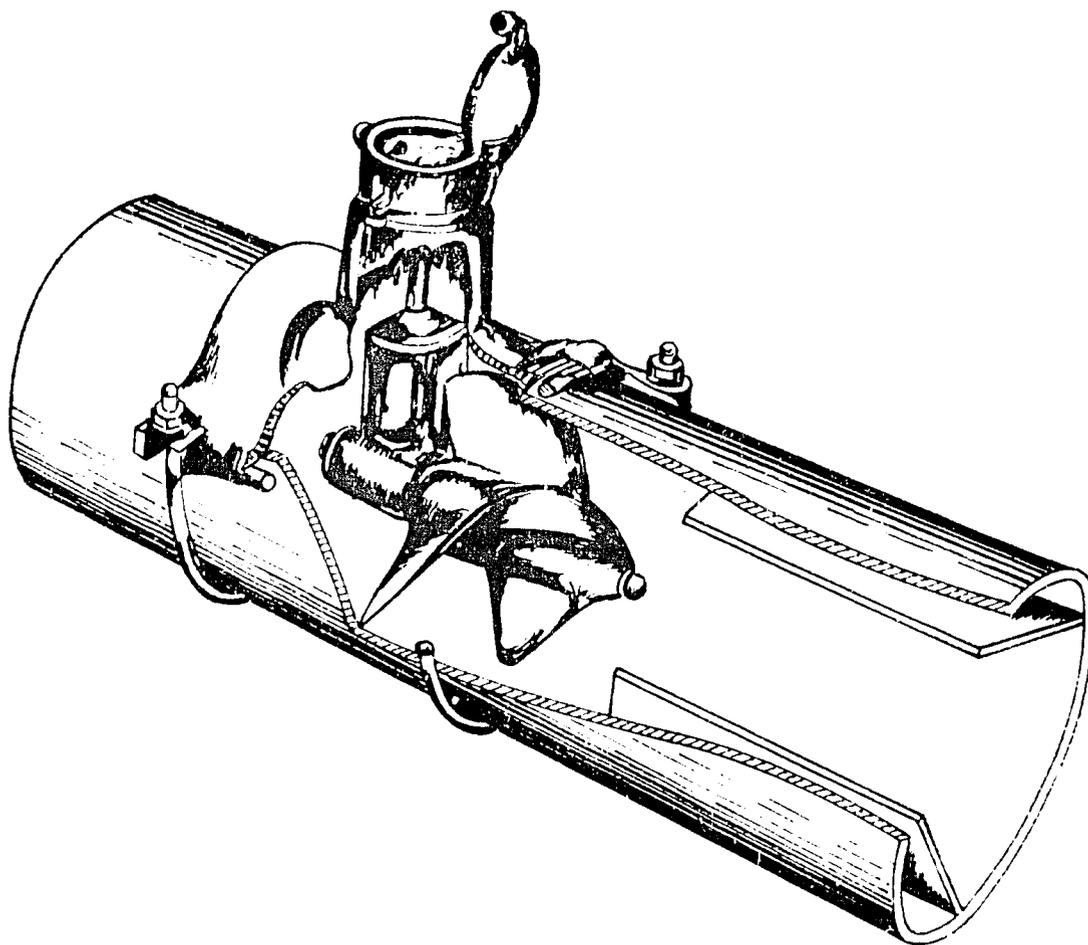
A Low-pressure line meter installed in a section of Steel pipe
